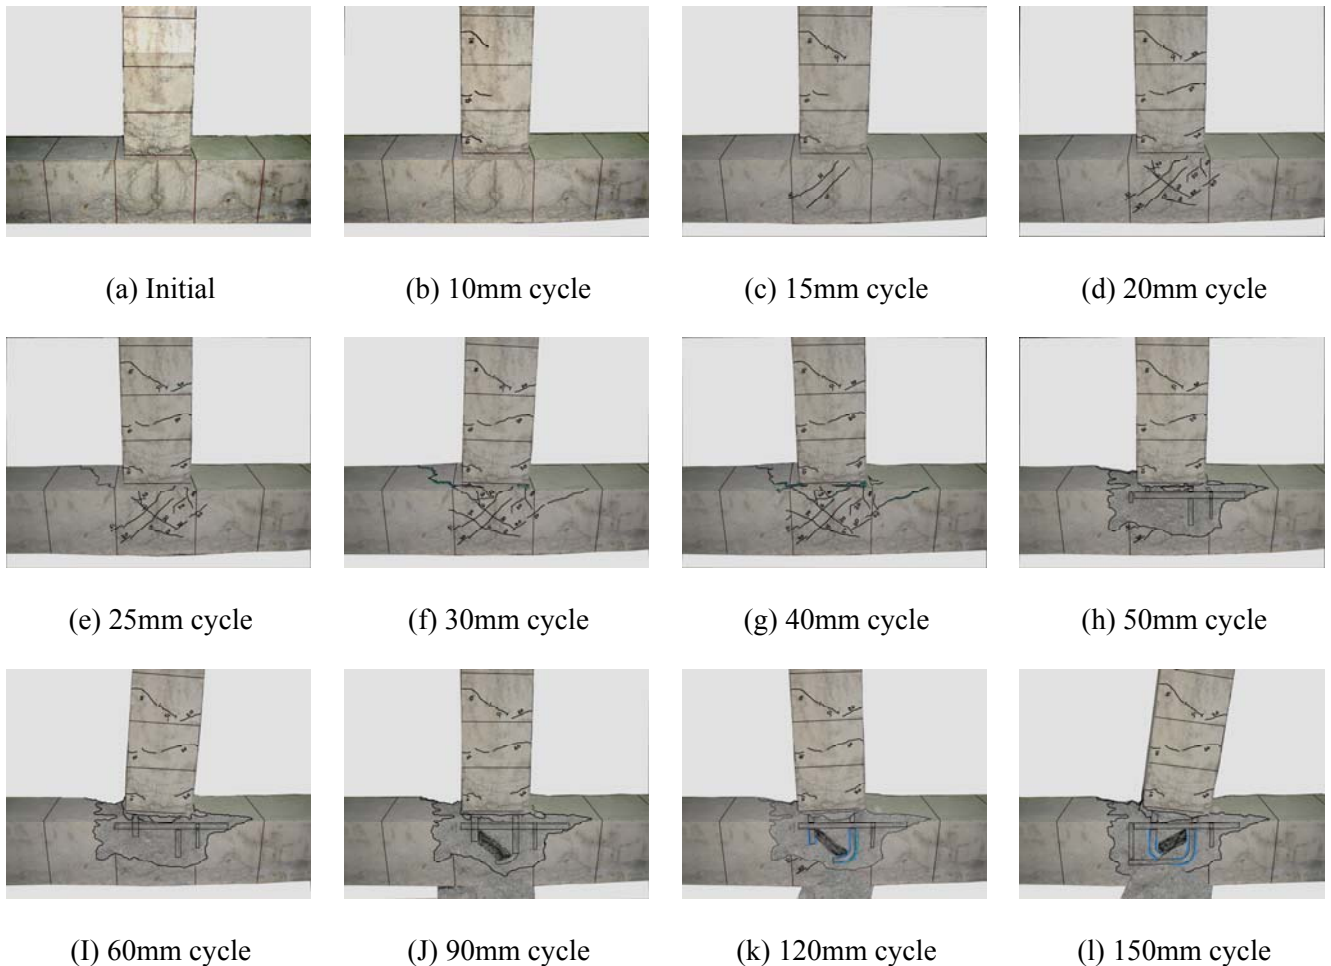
Sequential failure of Unconfined Beam-Column joint along with cracking at various loading cycles
